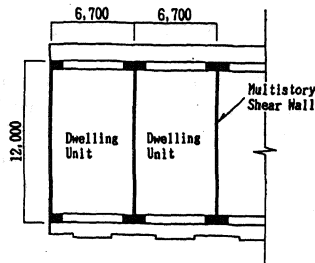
Plan of a R/C Frame Structure with Wall Columns
